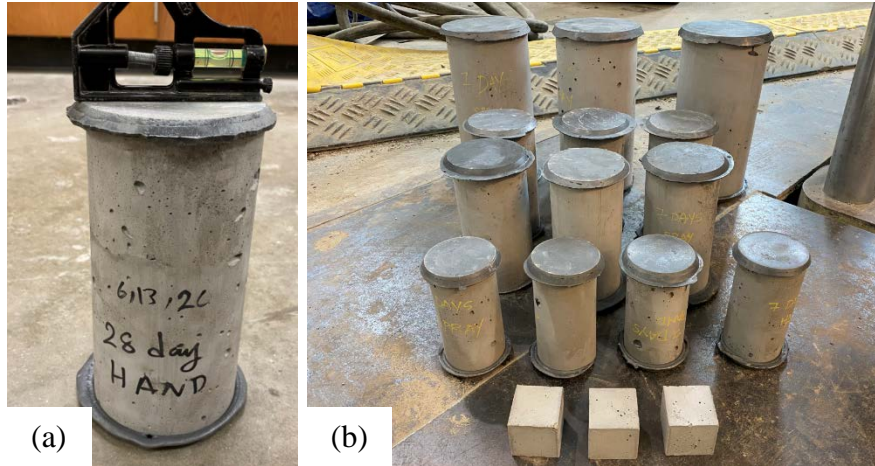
Geopolymer mortar compressive testing samples: (a) a sample capped with a sulfur capping compound which is perfectly levelled, and (b) testing specimens after 7 days of curing.
